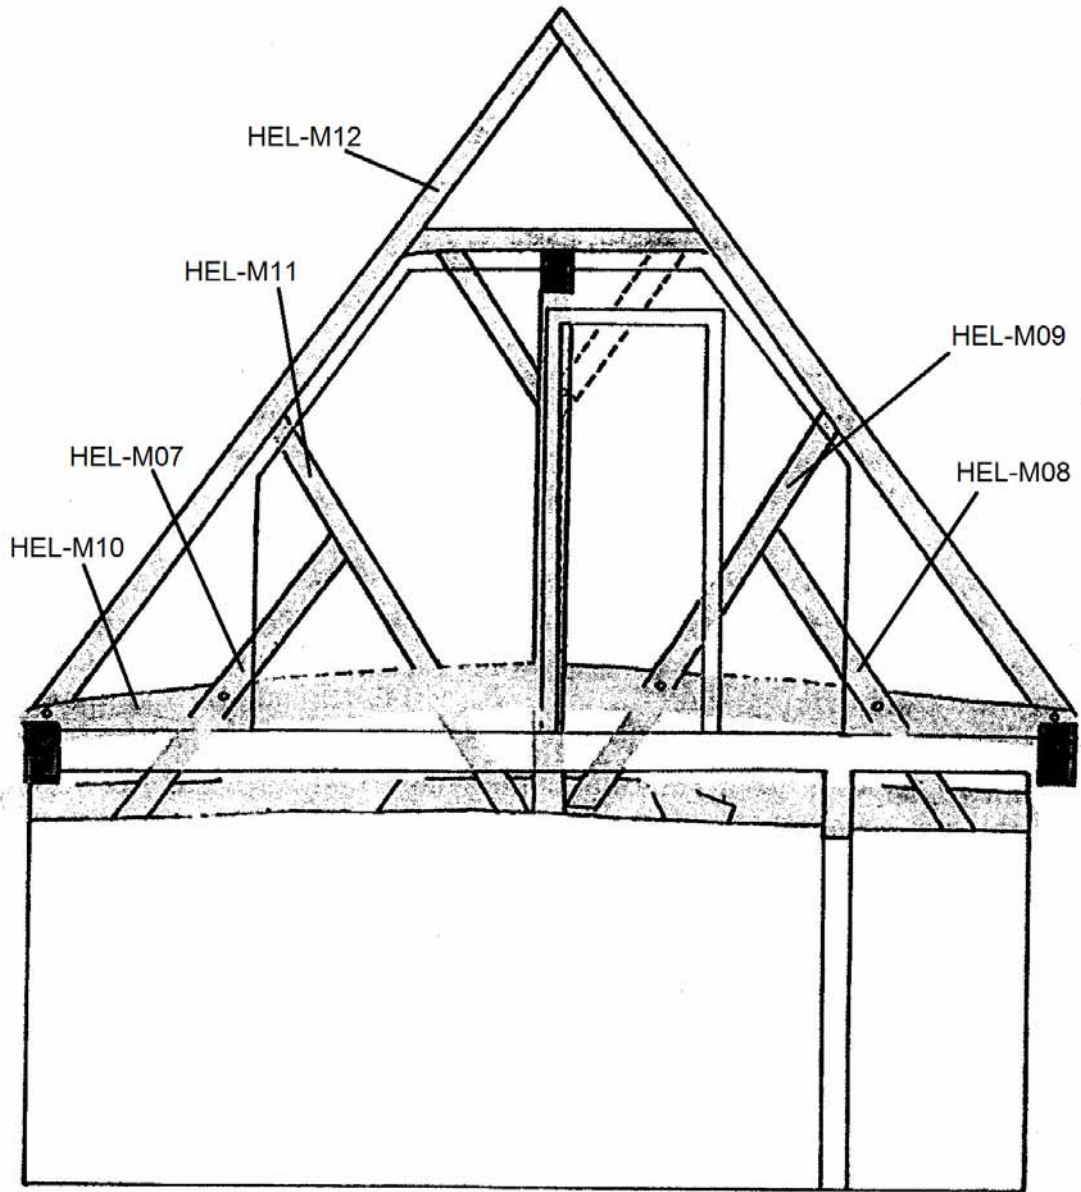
Hall house, truss 2, showing the location of samples HEL-M07-12 (Ryder 2012)
